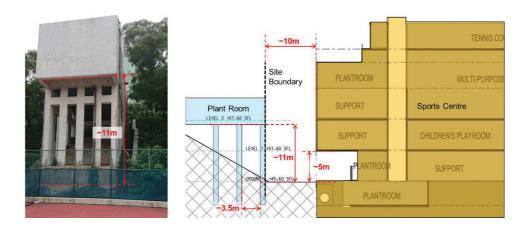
Schematic Section View of the Existing Plant Room and the Proposed Sports Centre under <u>Approved S16 Application Scheme</u>
